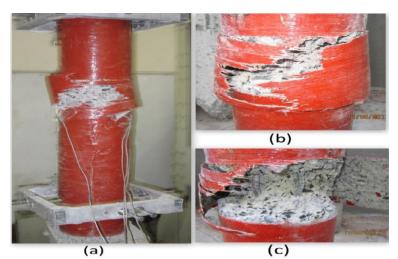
(a) Failure of GFRP wrapped circular column, (b) Closer view of failure portion & (c) Buckling of stirrups and failure shape
